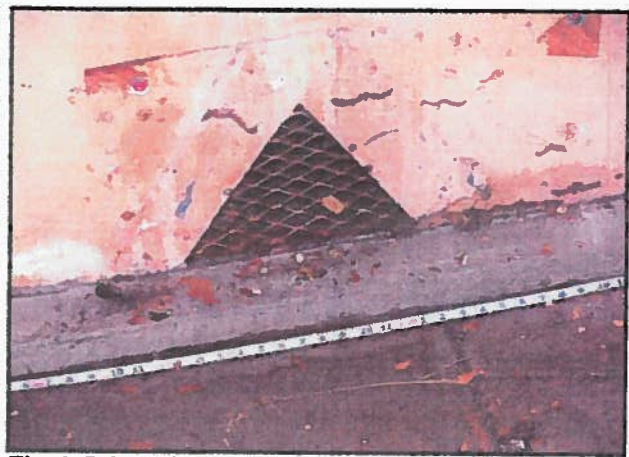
Drop ceiling for plumbing, electrical and HVAC. Fig. 2. Triangular grate and 2 inch concrete dam.
